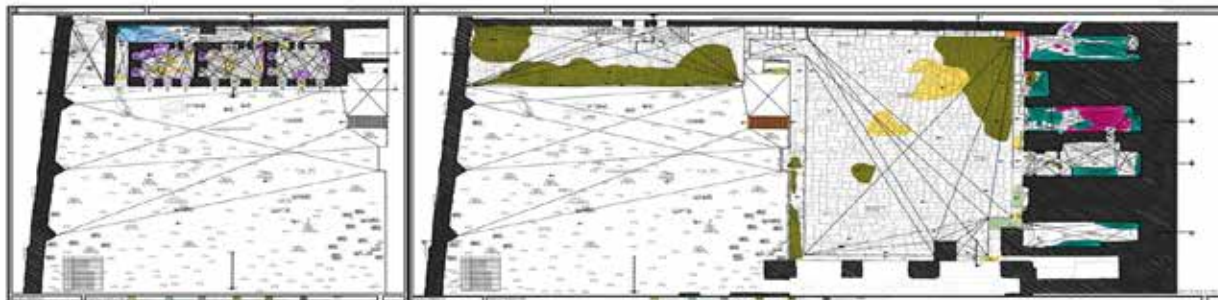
Plan of Arslanhane-cage and Şimşirlik Garden ,Topkapi Palace(Sedes Architects Archive)
